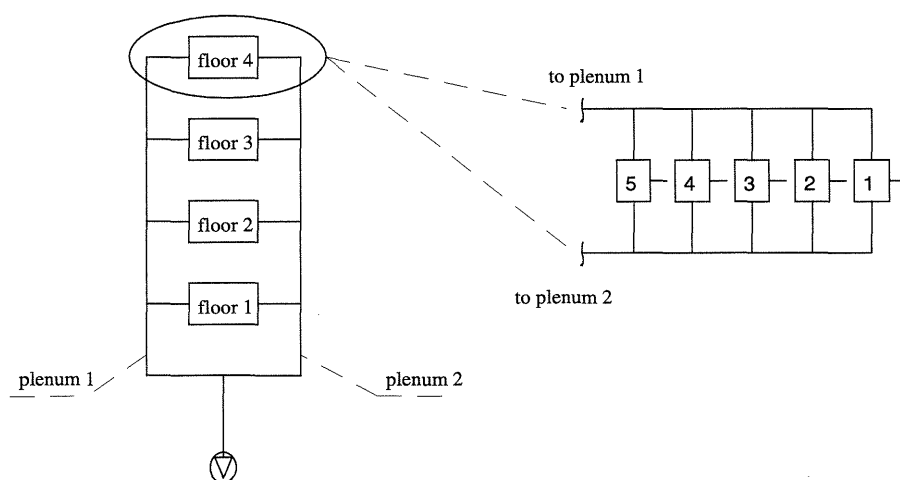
Layout of exhaust ventilation system with two plenums for four floors and five rooms on each floor.
